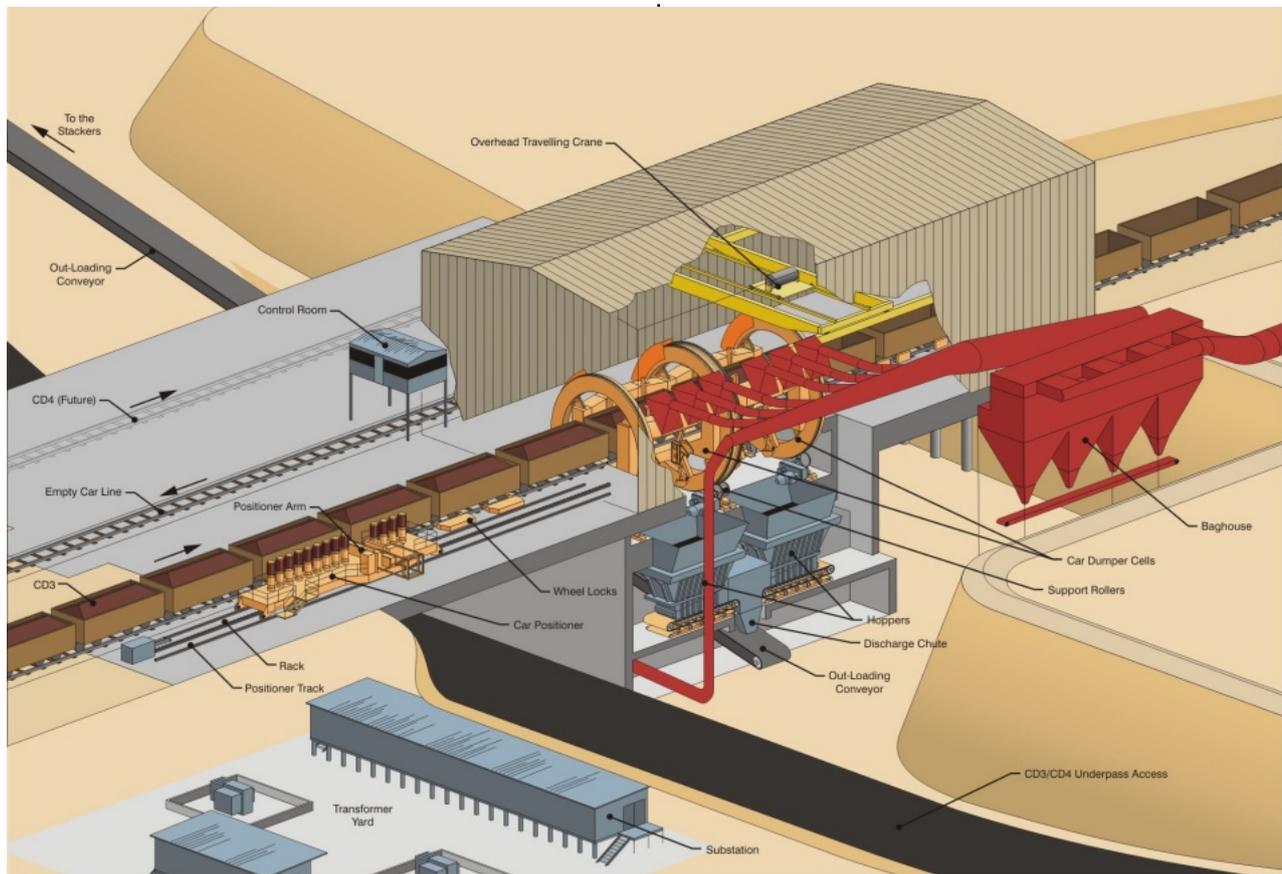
Dampier Port Upgrade Project –car Dumper Facility Isometric
